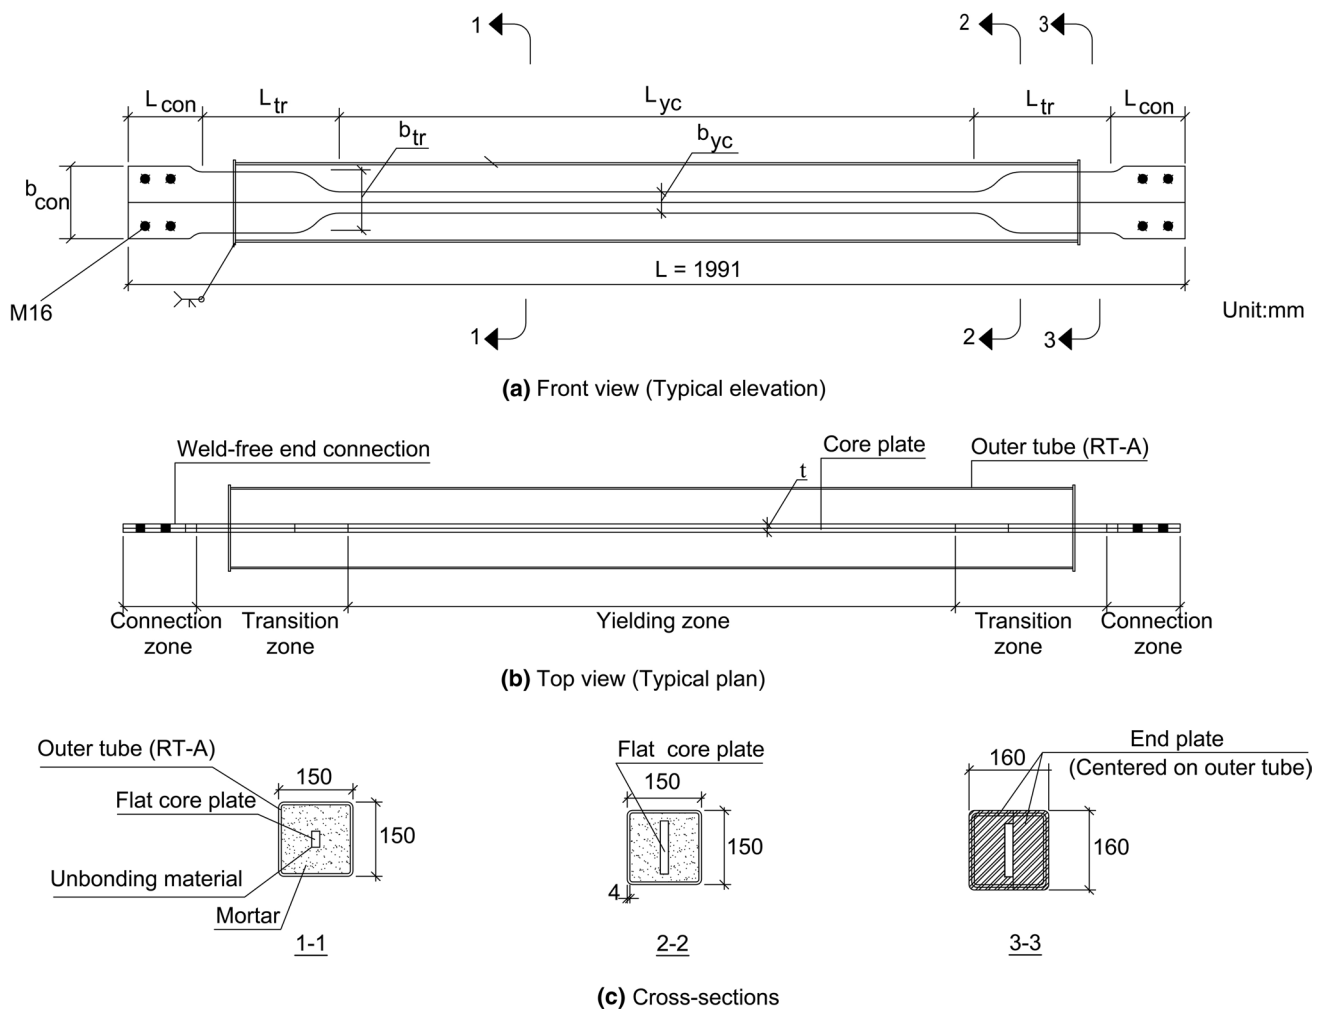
Specimen configurations for weld-free end connection BRBs
